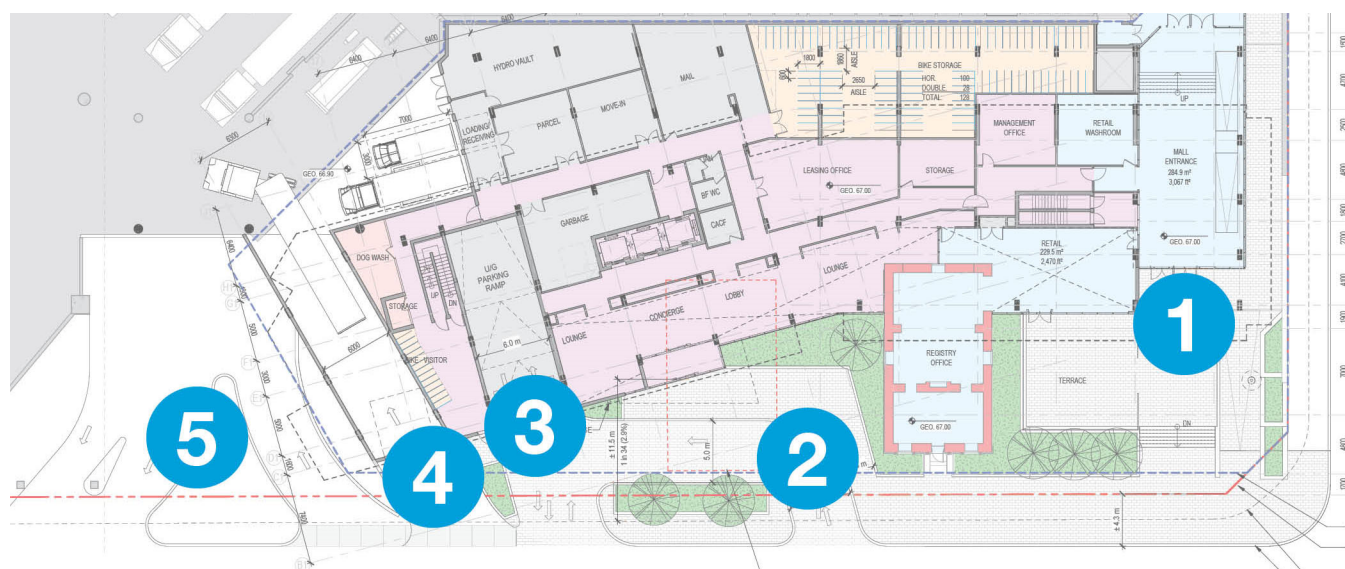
Proposed Access Points (1 - Revised pedestrian western access to CF Rideau Centre; 2 - Vehicle Lay-By Area for residential entrance; 3 - Underground parking access for proposed building; 4 - CF Rideau Centre & Shaw Convention Centre loading area access; 5 - CF Rideau Centre & Shaw Convention Centre visitor parking area access)
